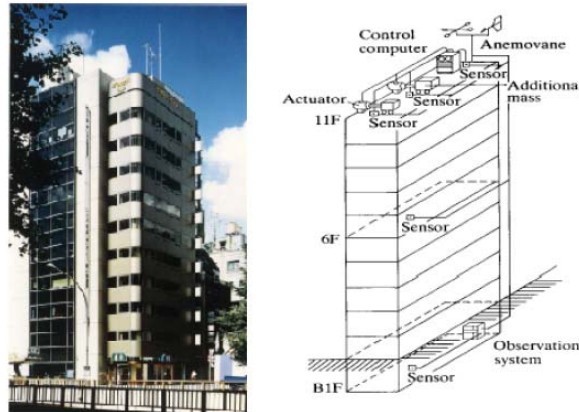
Kyobashi Siewa Building (Agarofinei, 2010).
